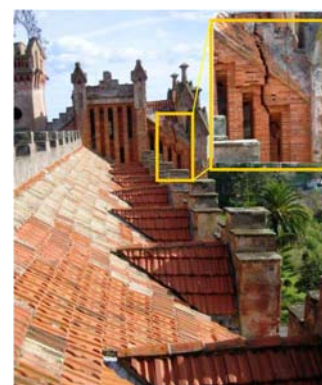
“Overview of the South facade crack from the West tower”
